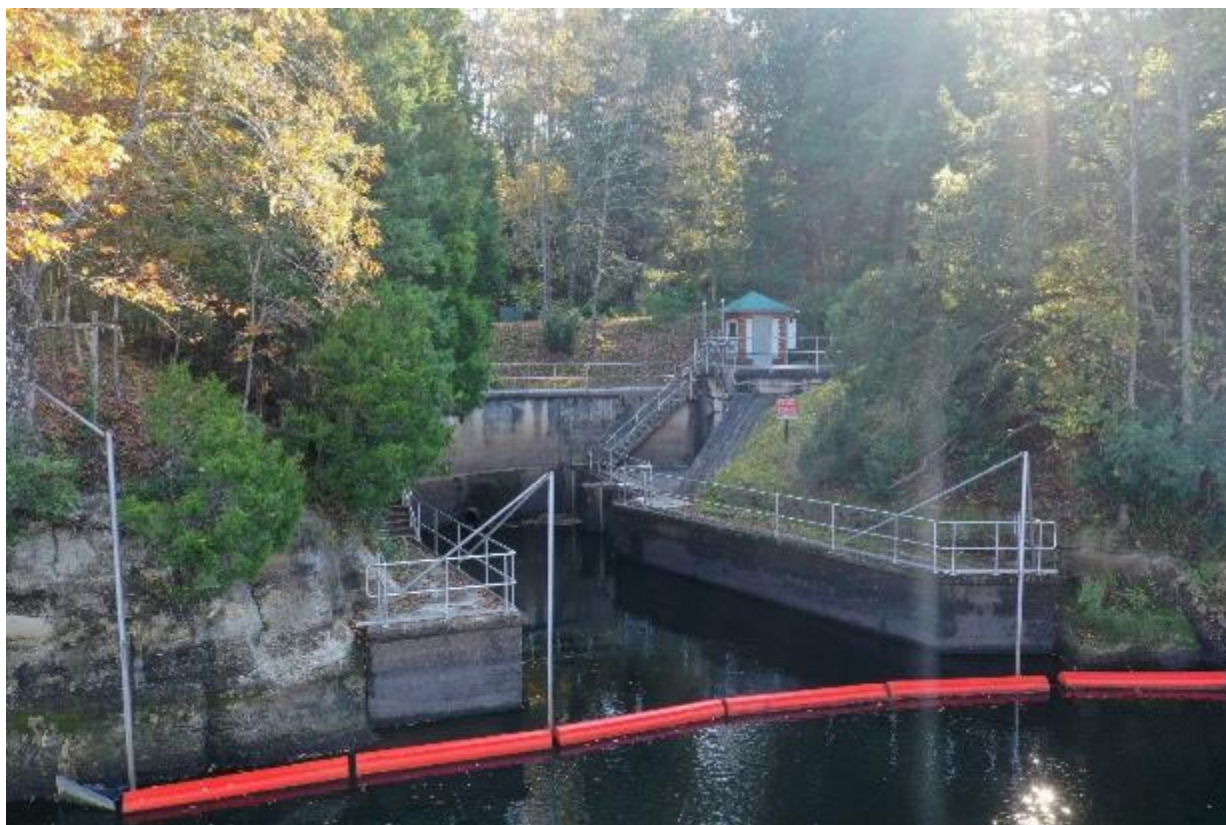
Givhans Ferry Source Water Intake<sup>34</sup>
